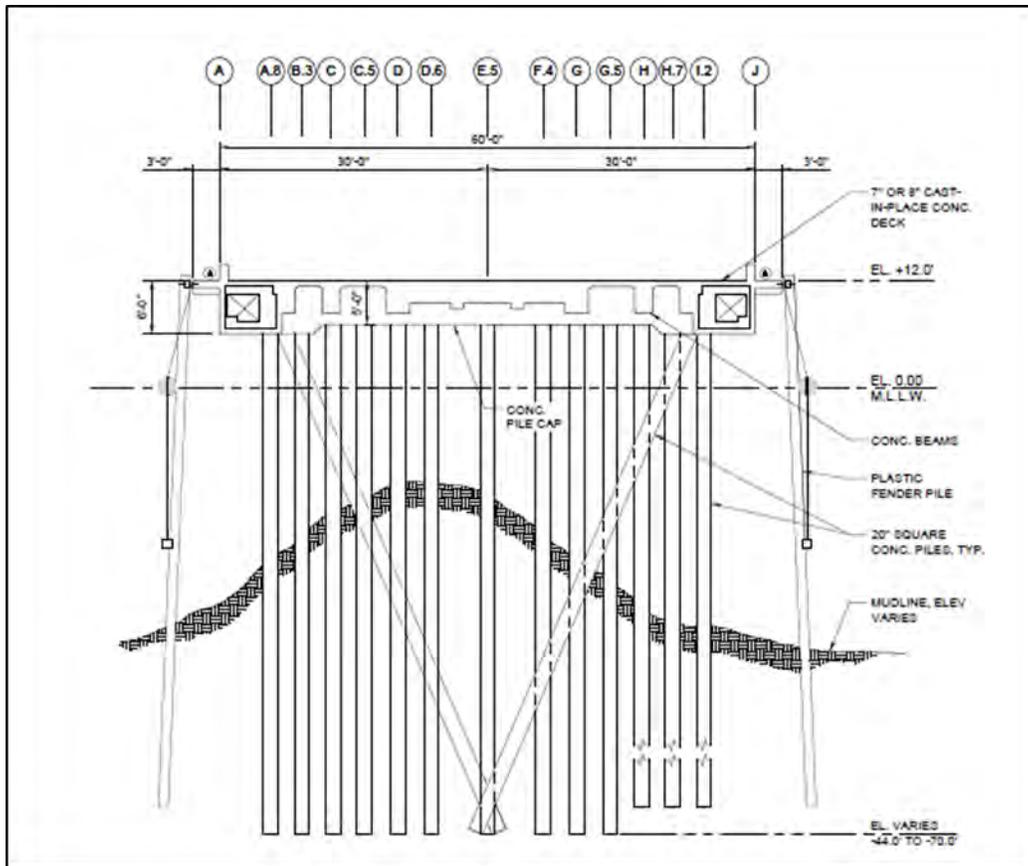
Existing Cross-Section of Pier 6 (typical)
